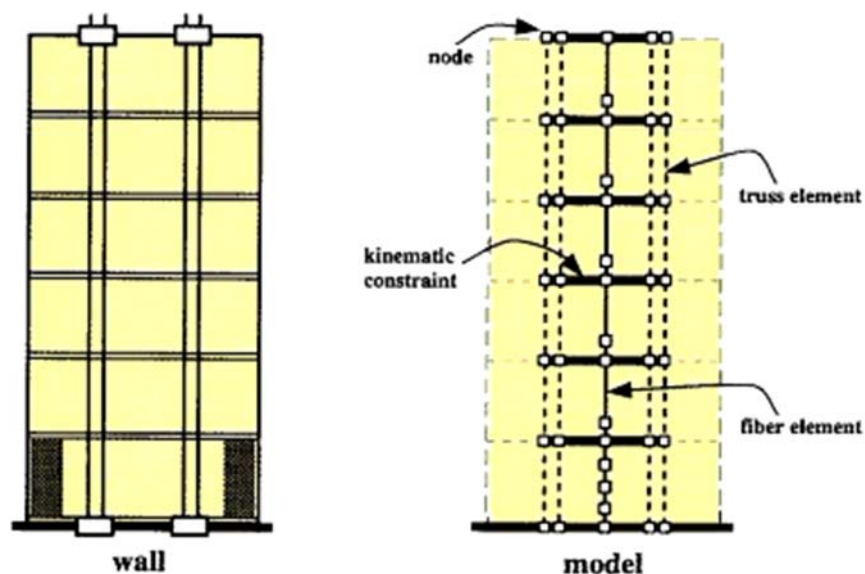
Fiber model used for modelling precast concrete walls (Kurama et al. 1999)
